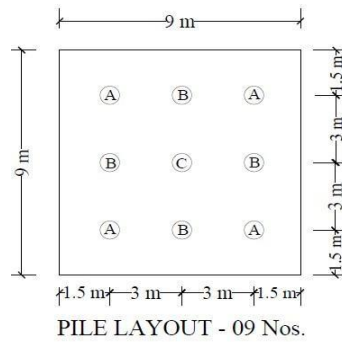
Plan of Pile raft foundation system with pile types A, B and C
